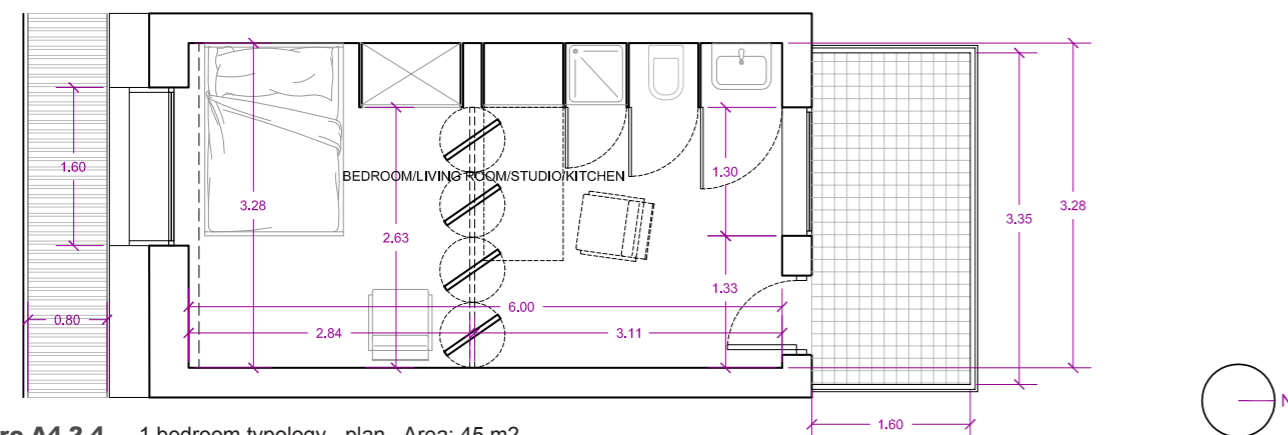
1 bedroom typology - plan - Area: 45 m2
